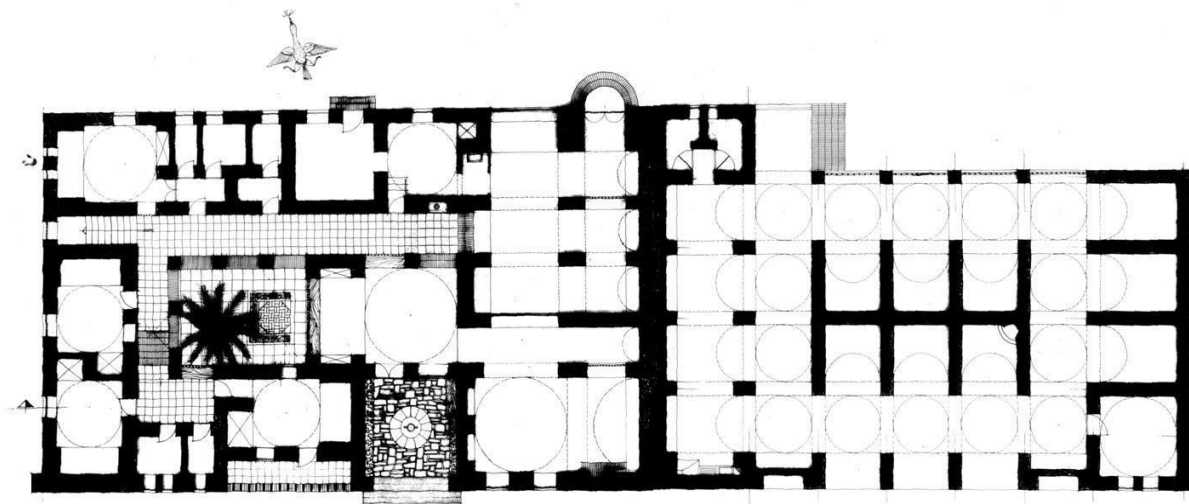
New Gournia Village-crafts exhibition: design drawing, plan
